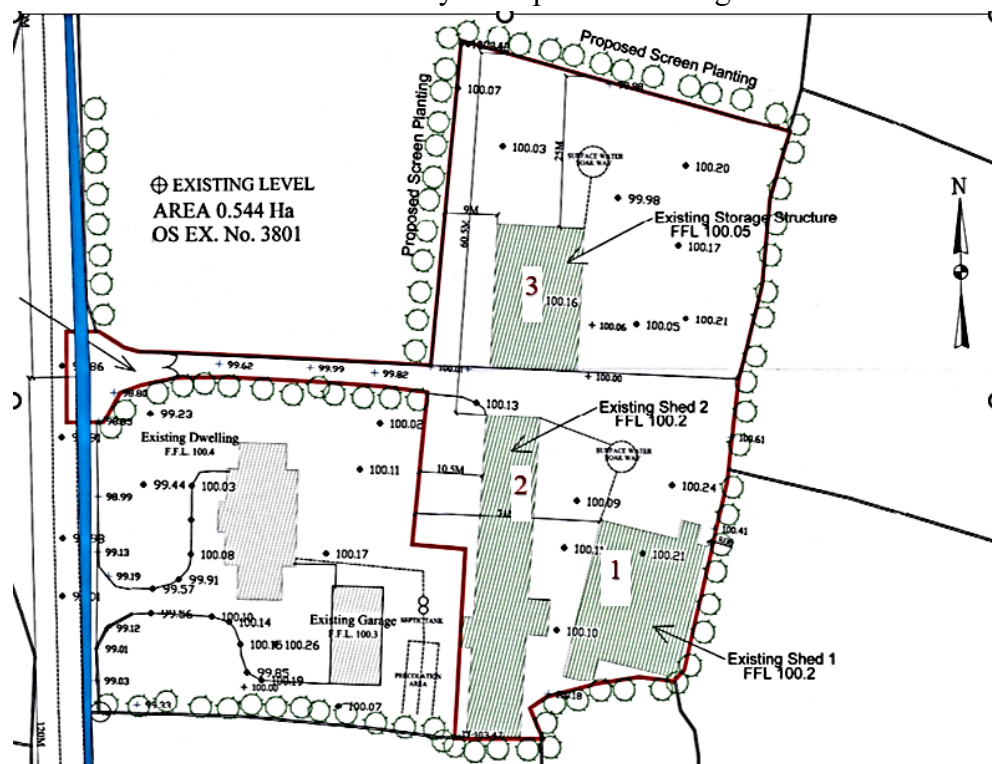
Existing site layout with sheds numbered 1, 2 and 3, from planning drawings
